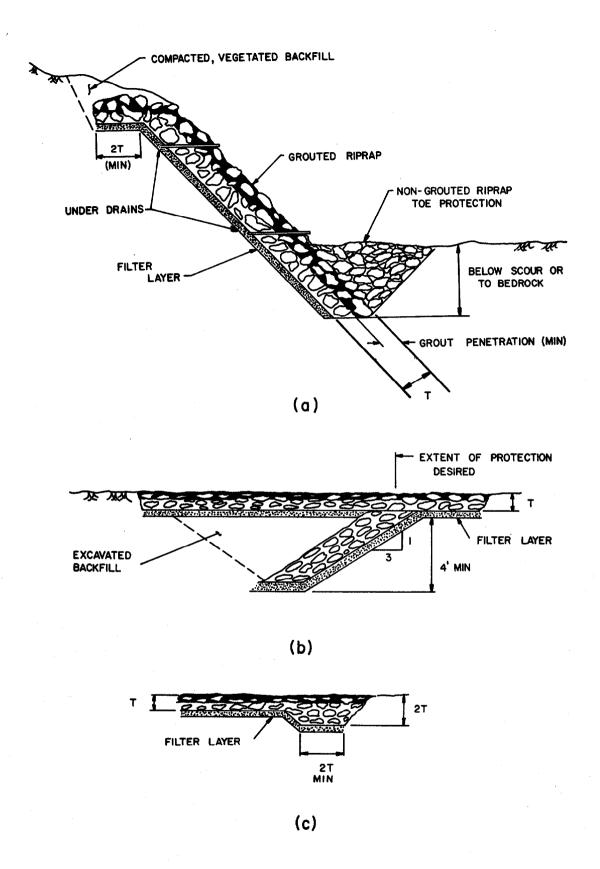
Grouted riprap sections: (a) section A-A; (b) section B-B; and (c) section C-C. (refer to figure 39 for section locations)
